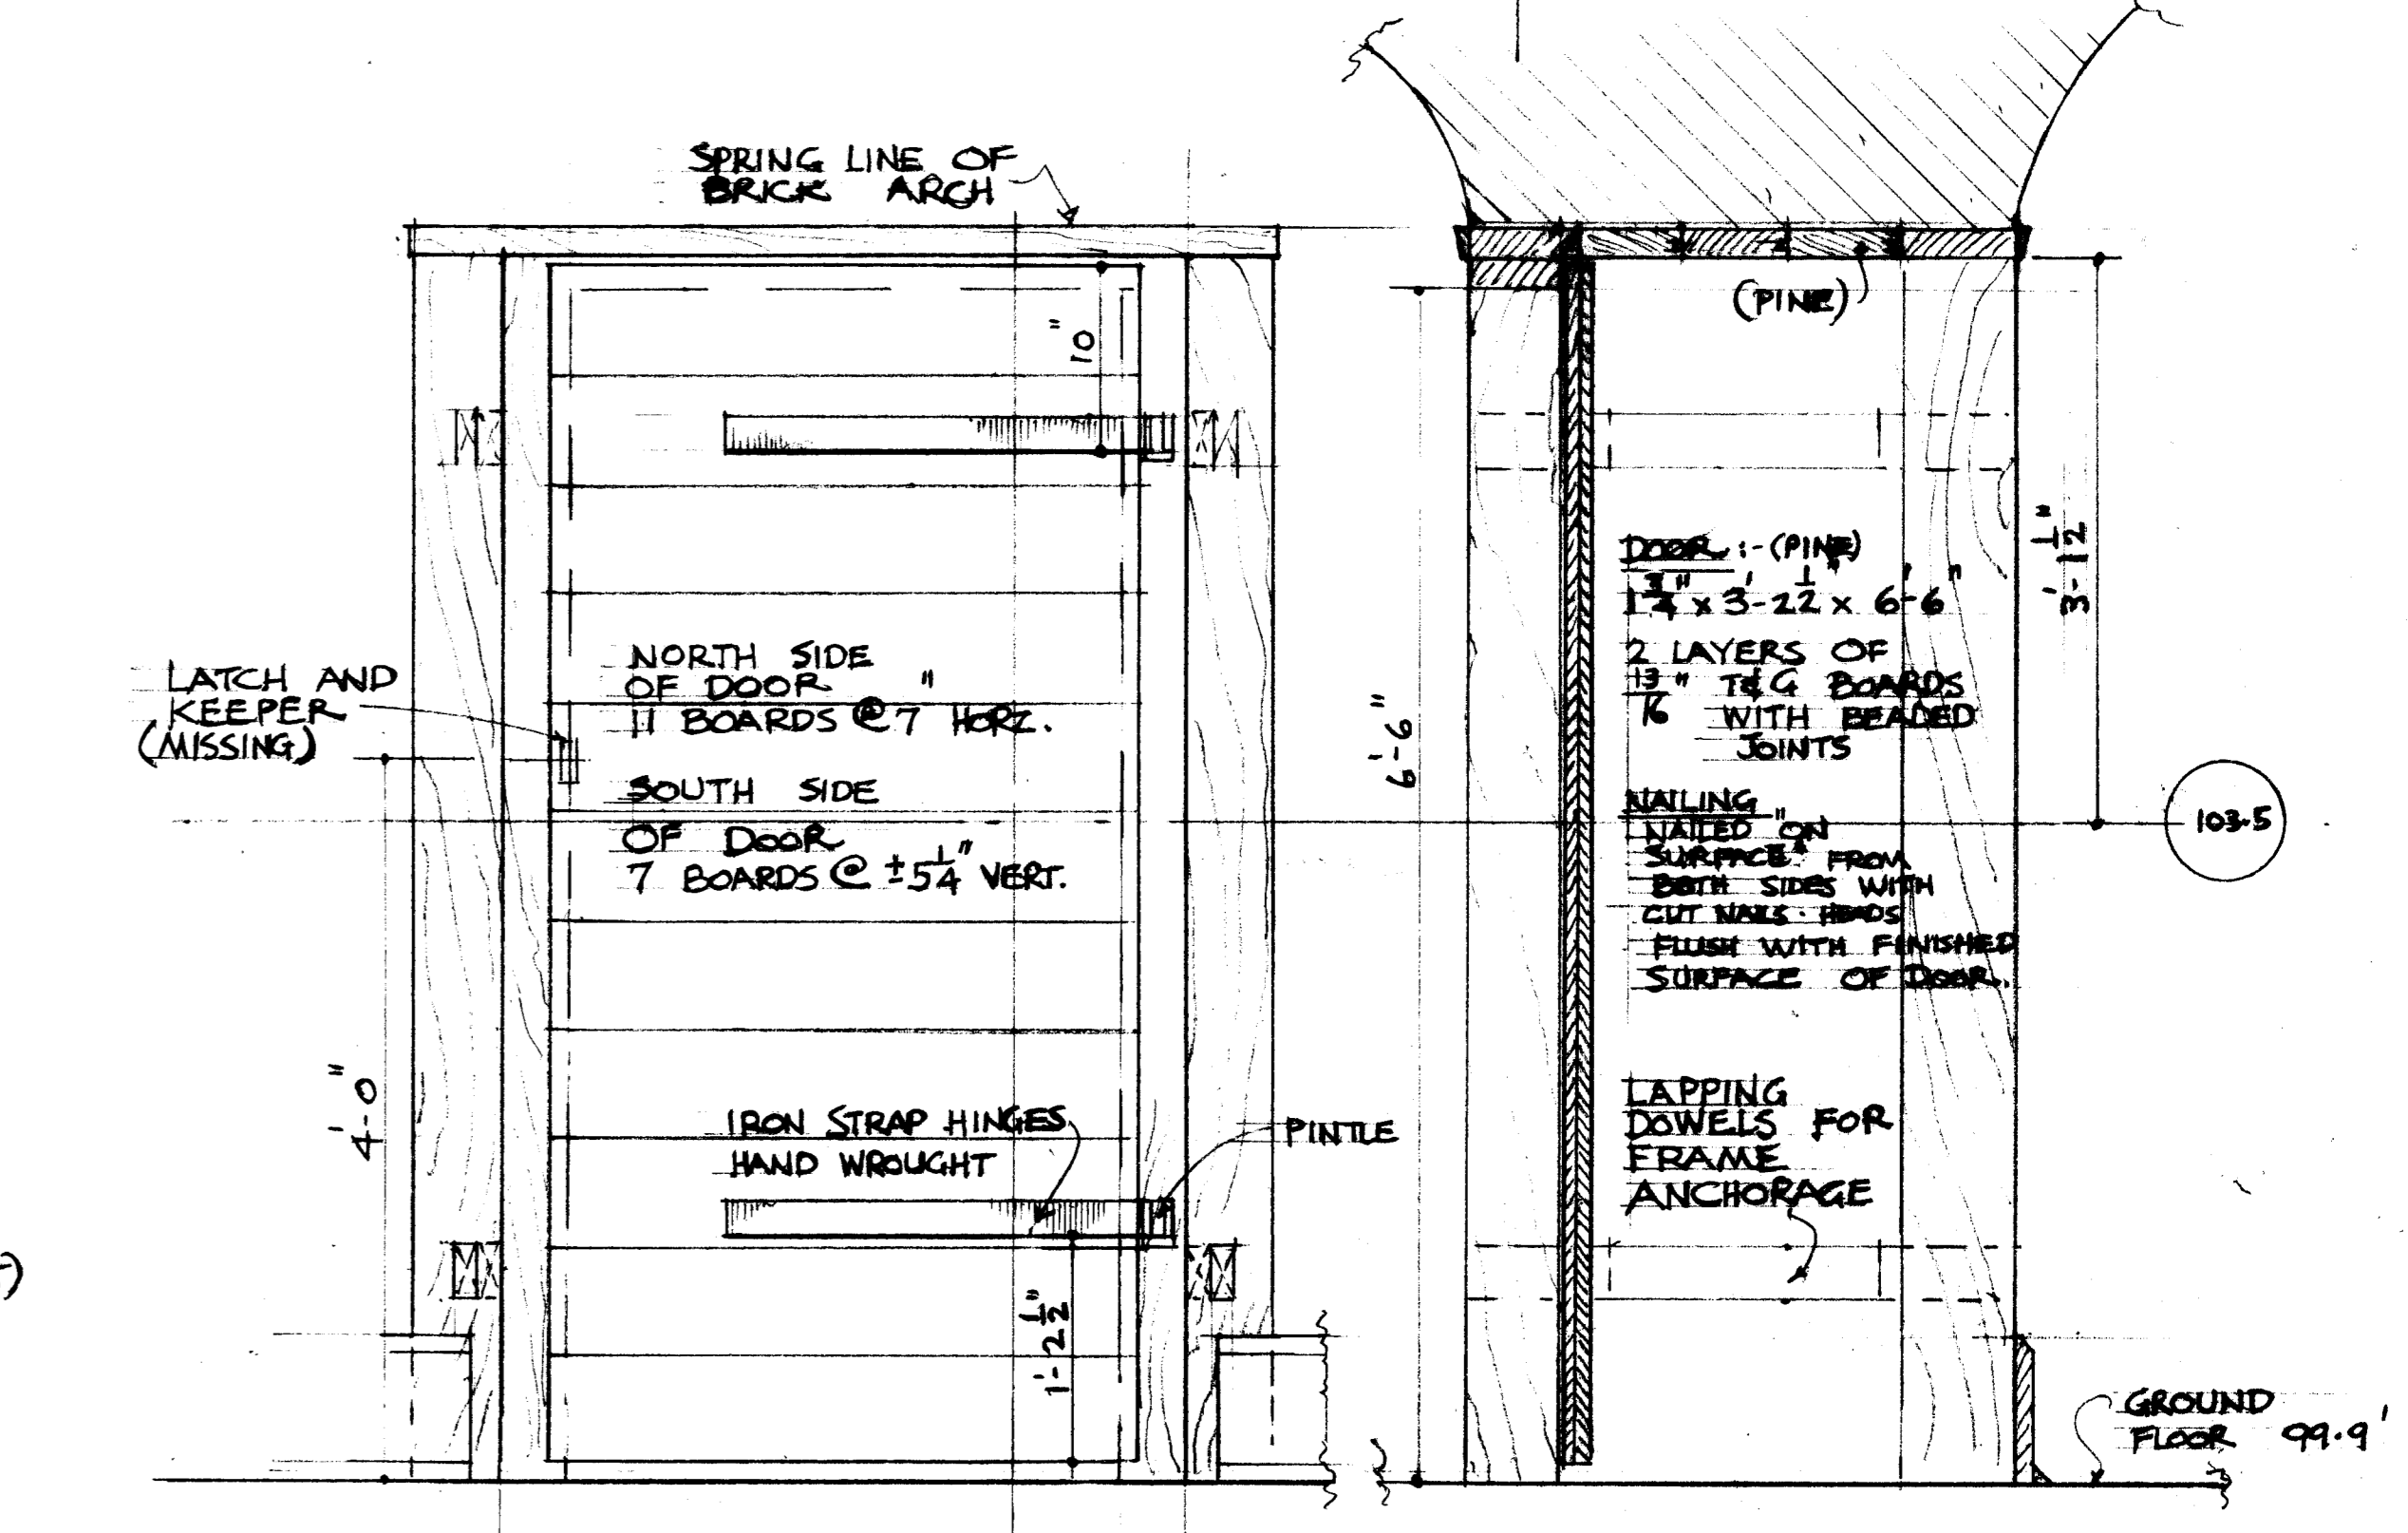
DETAILS OF TYPE B DOOR AND DETAILS OF VESTIBULE PARTITION ADJOINING STAIR AT GROUND FLOOR
